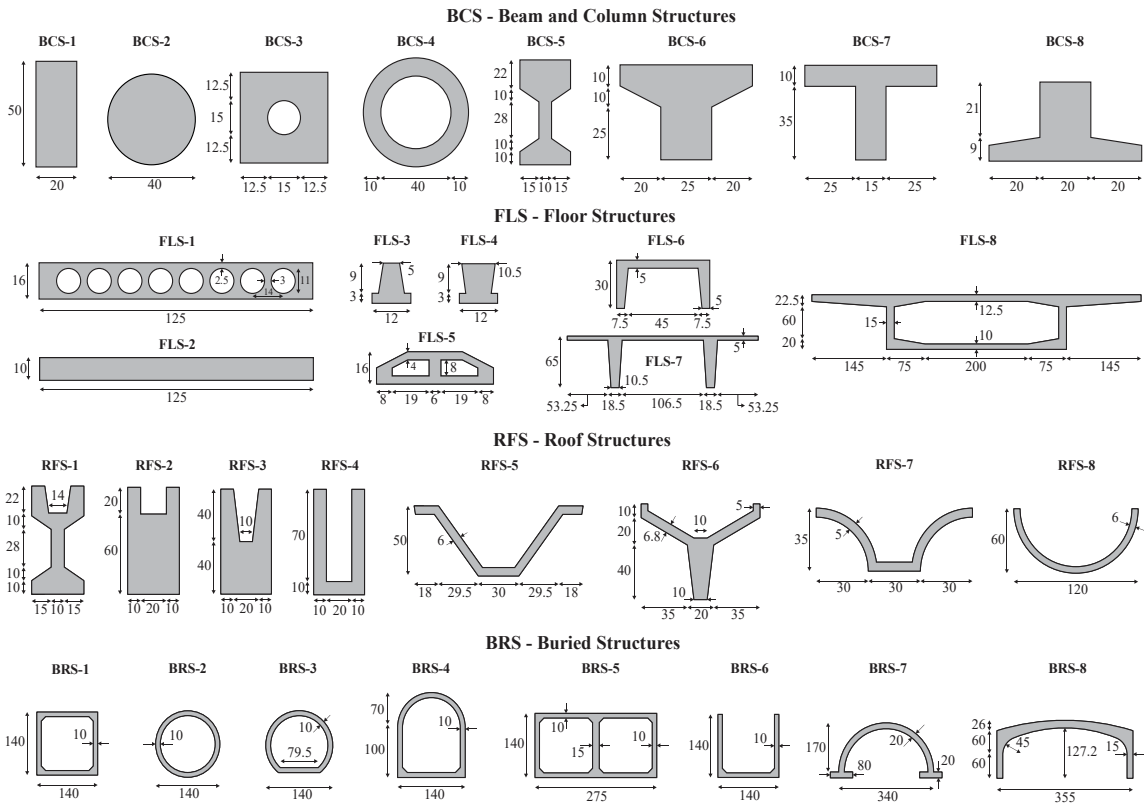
Geometry of the cross-sections of precast concrete groups (dimensions in cm).
